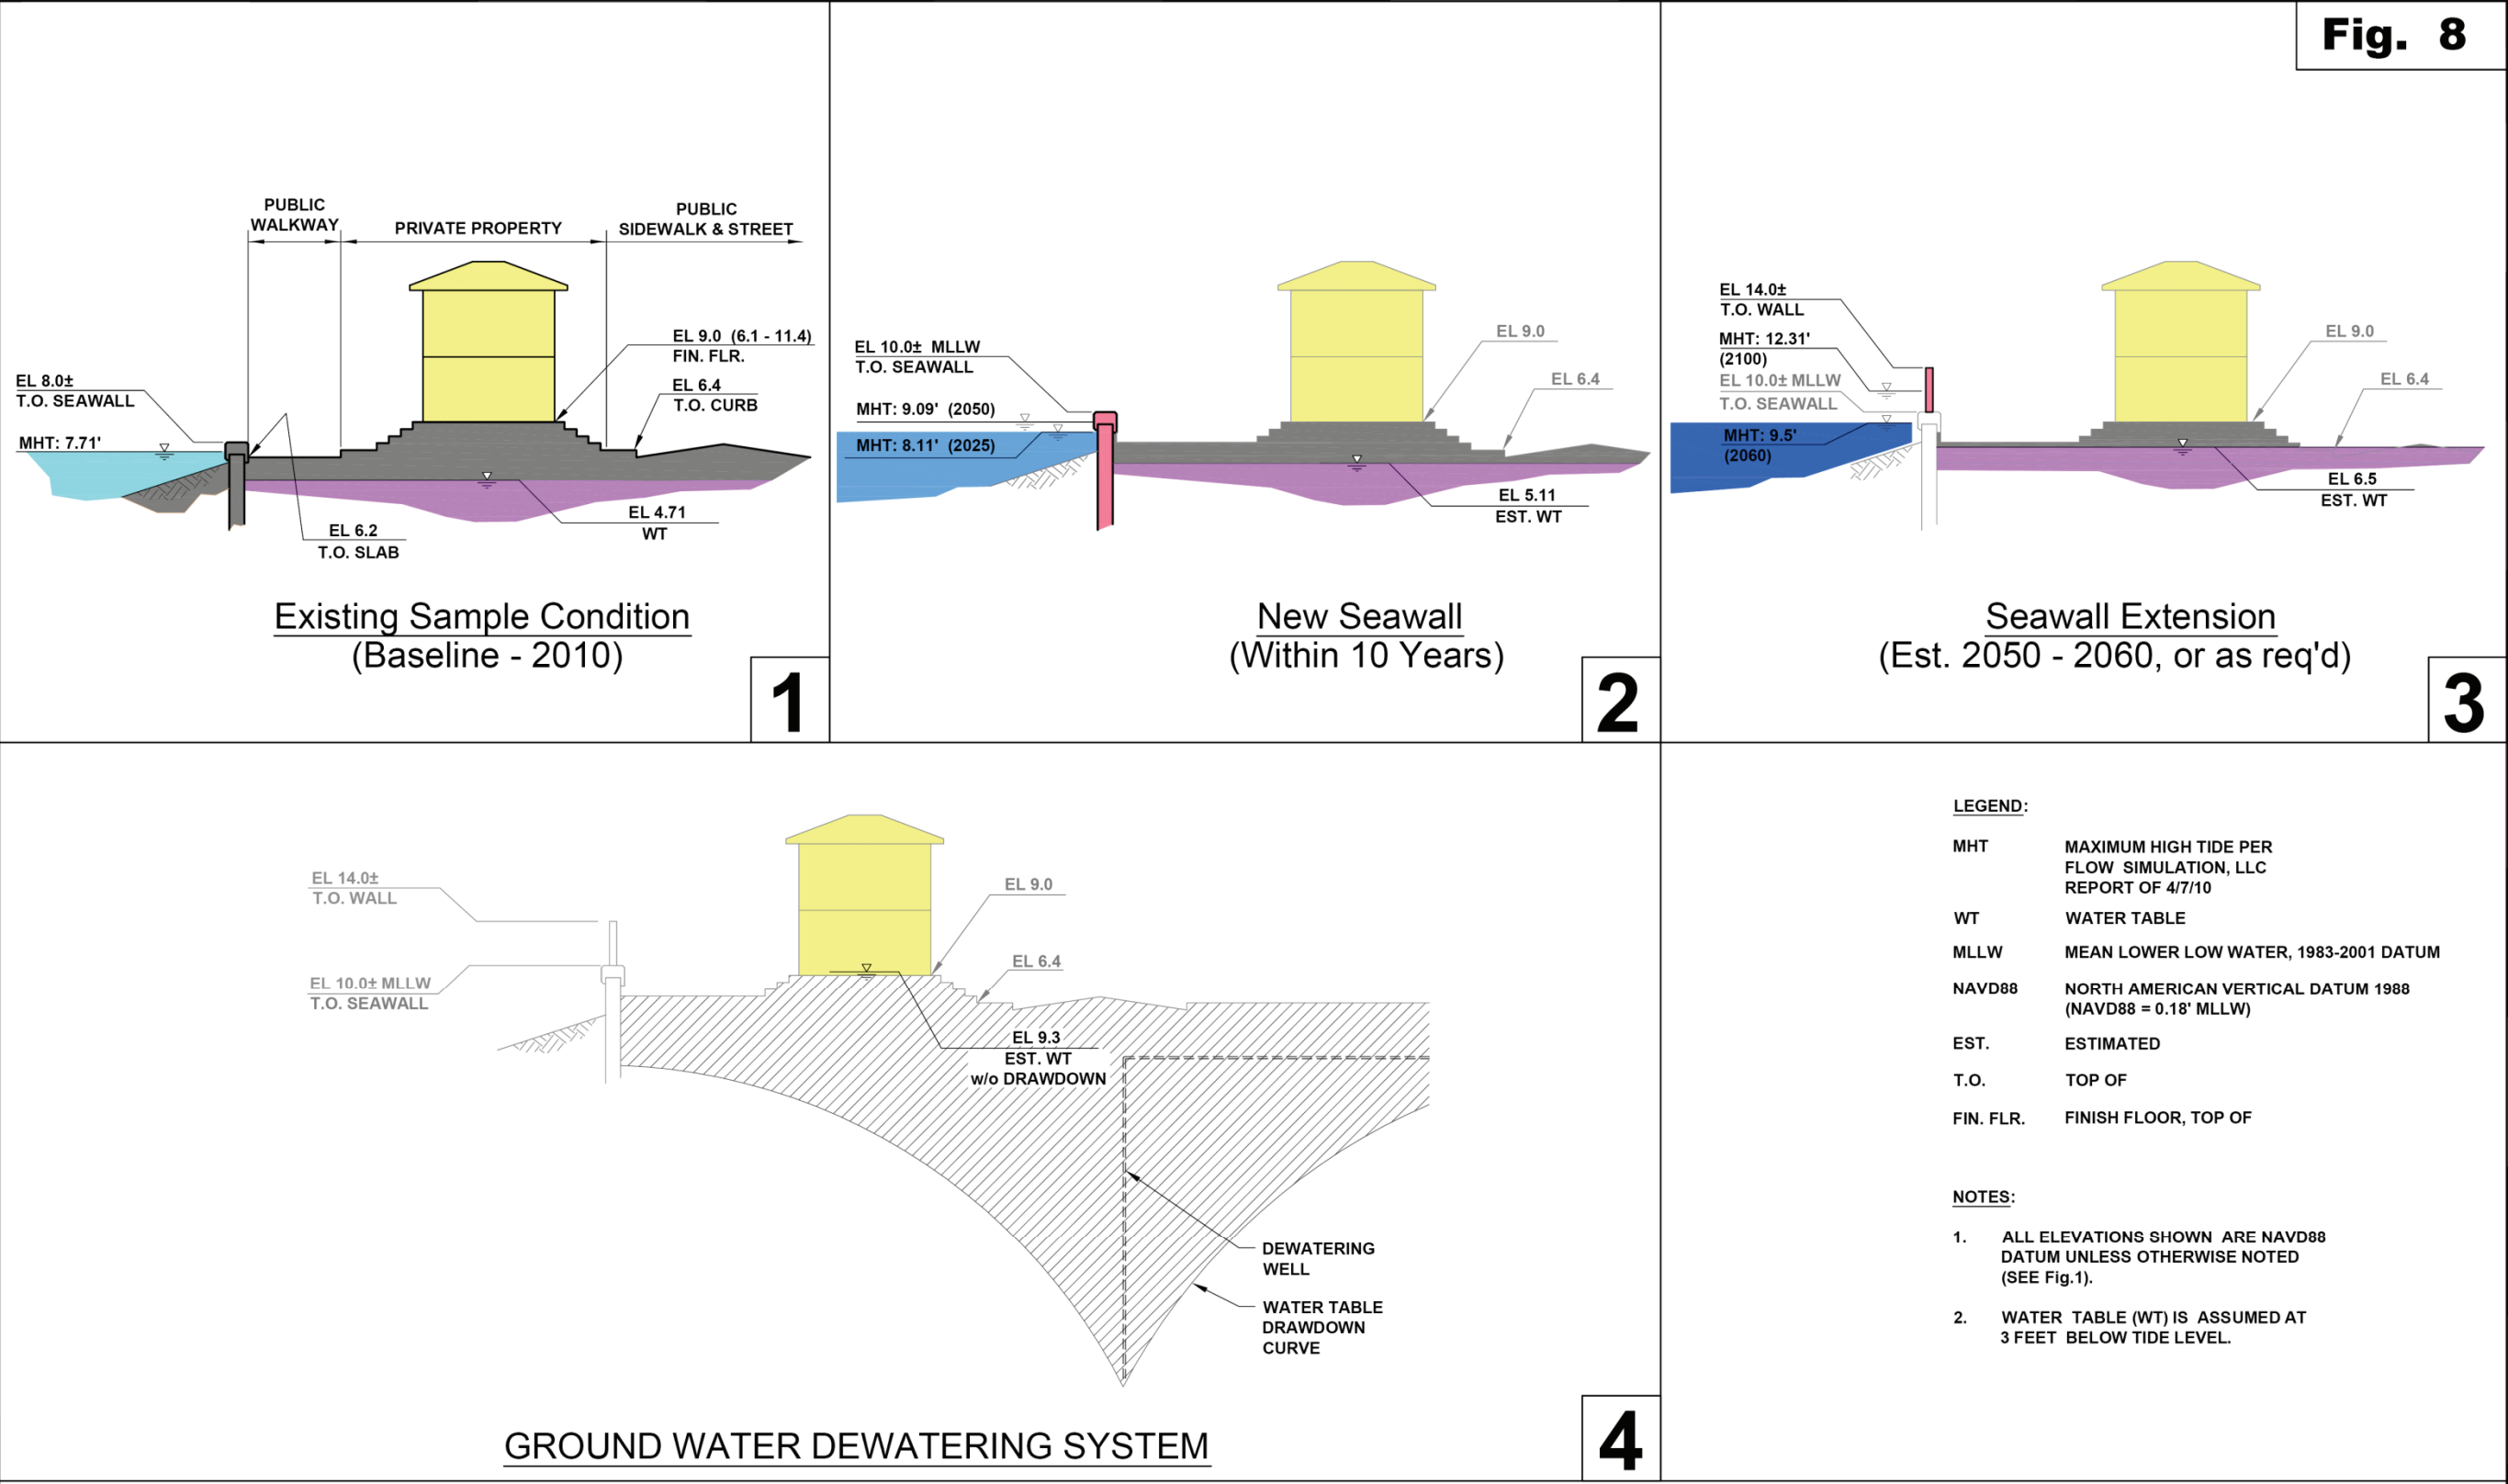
Conceptual Seawall Replacement Implementation Plan
